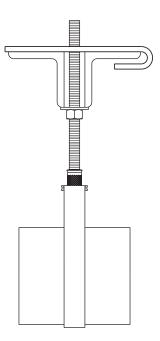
Trus Joist Beam Clamp (B-Line Fig. B3052)
